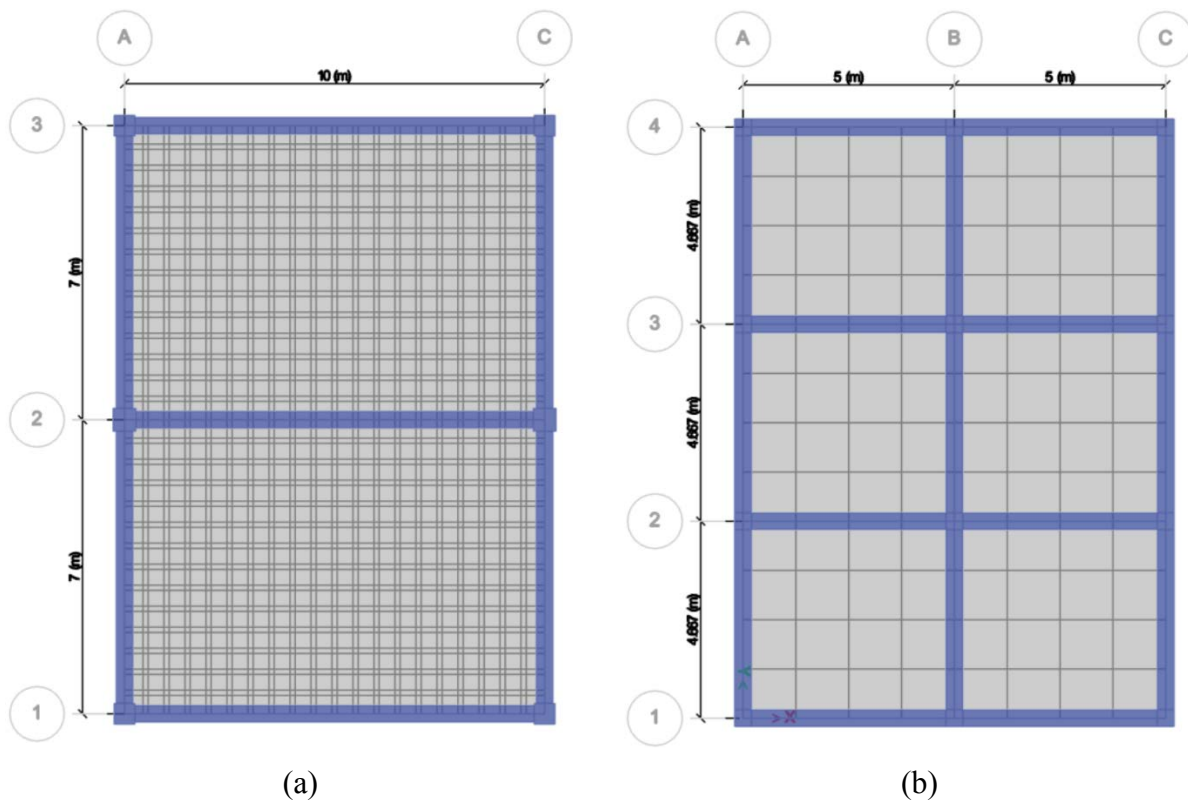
The plan view of structures with a) U-boot slab, and b) two-way slab.
